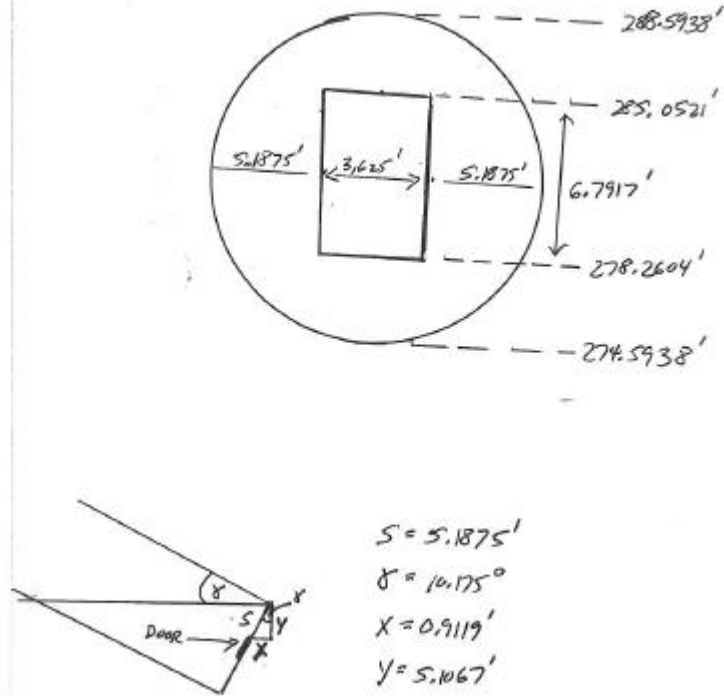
Equipment Hatch Barrel Access Door (Area Source)
